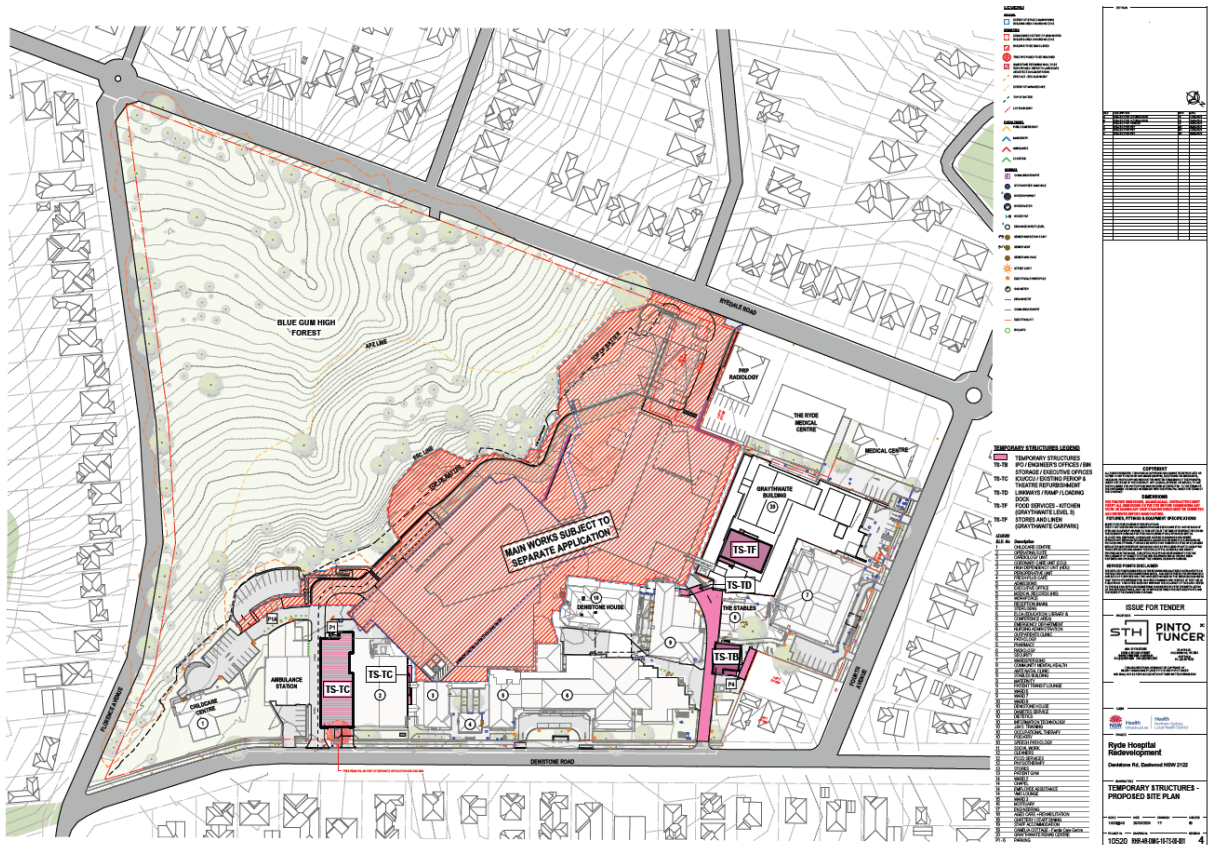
Temporary Structures, Proposed Site Plan, showing proposed development
